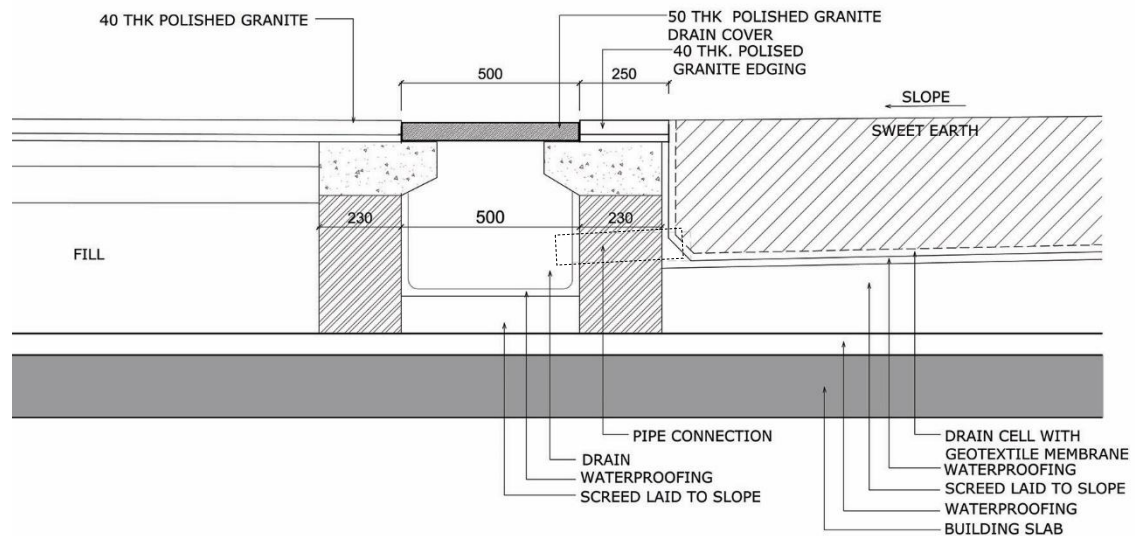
TYPICAL DETAILS OF GREEN AREA/TERRACE GARDEN
